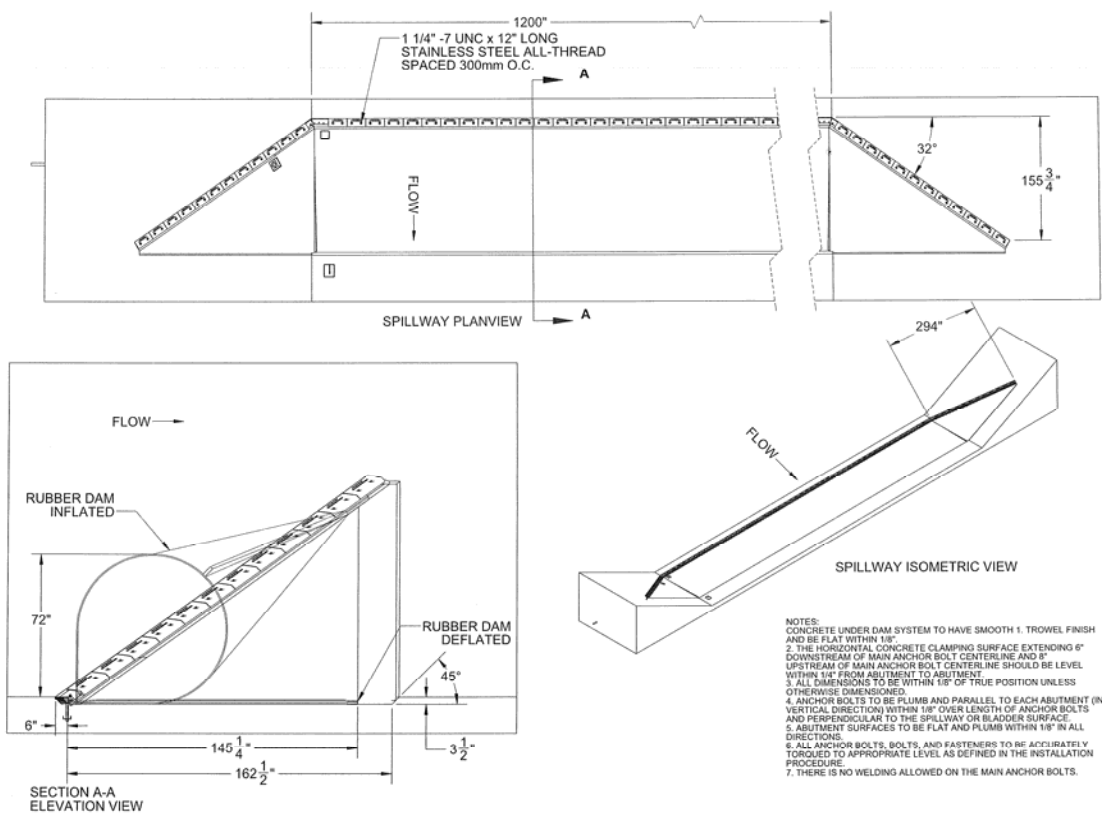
Traditional Rubber Dam, Schematic Drawing
